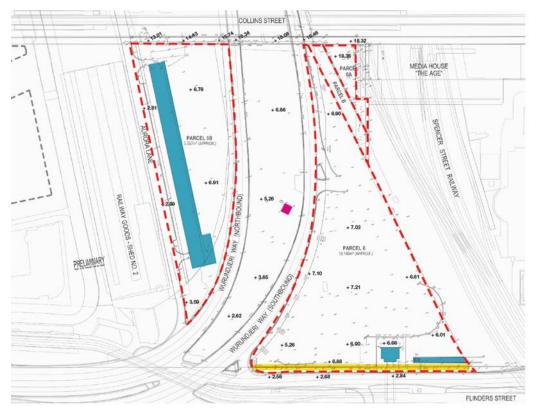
EXISTING SITE BOUNDARIES OF ENTIRE DEVELOPMENT PLAN SITE
